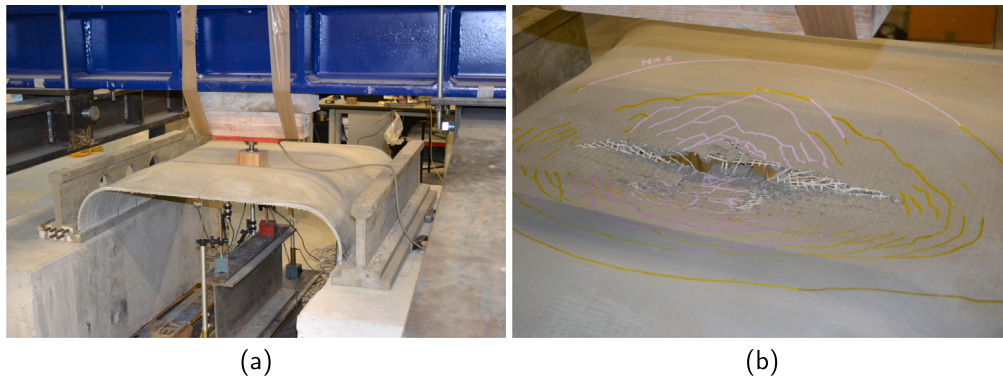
Picture of the centered load test setup (a) and detail of the failure mode at the end of the test (b).
